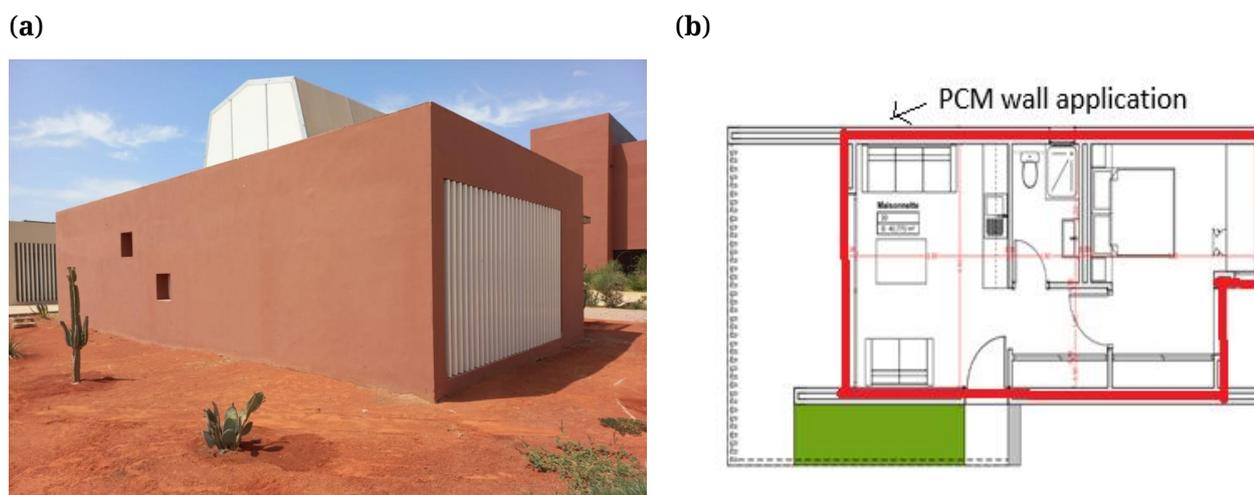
(a) Photo of the real building, (b) Plan view of the building case study.
